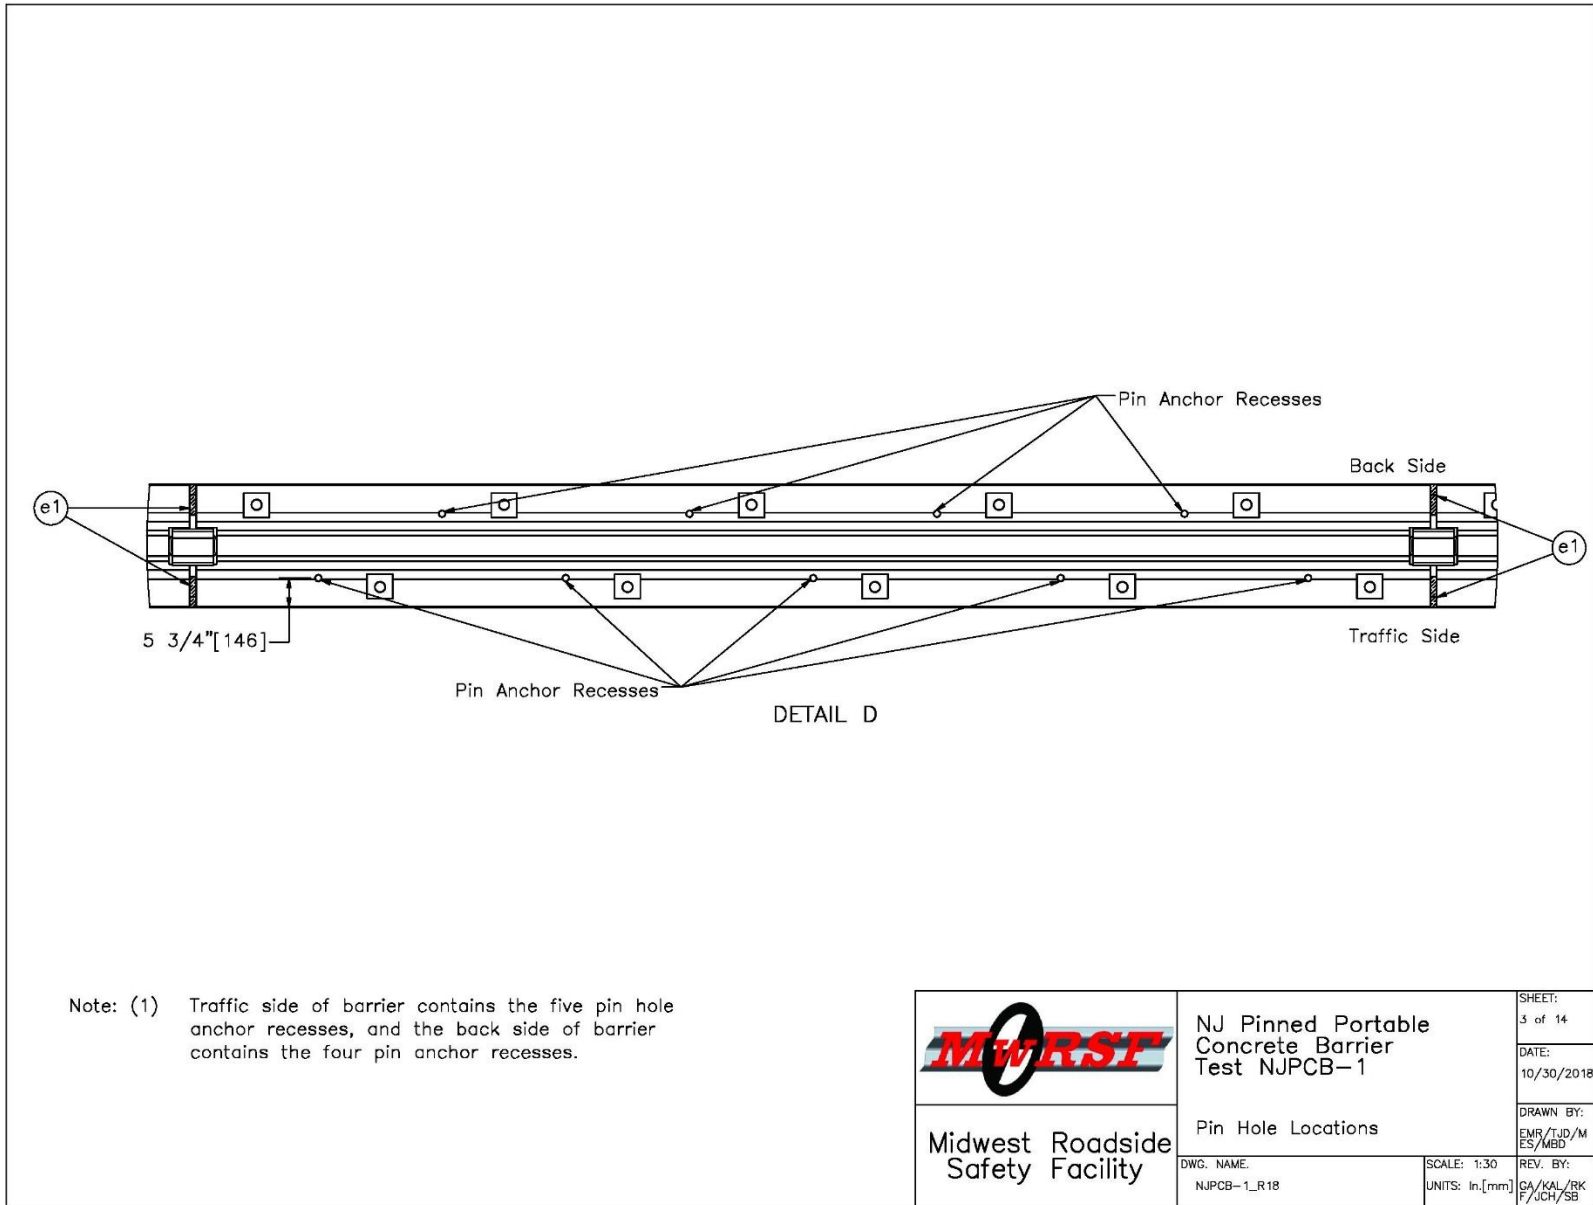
PCB Pin Anchor Locations, Test No. NJPCB-1
